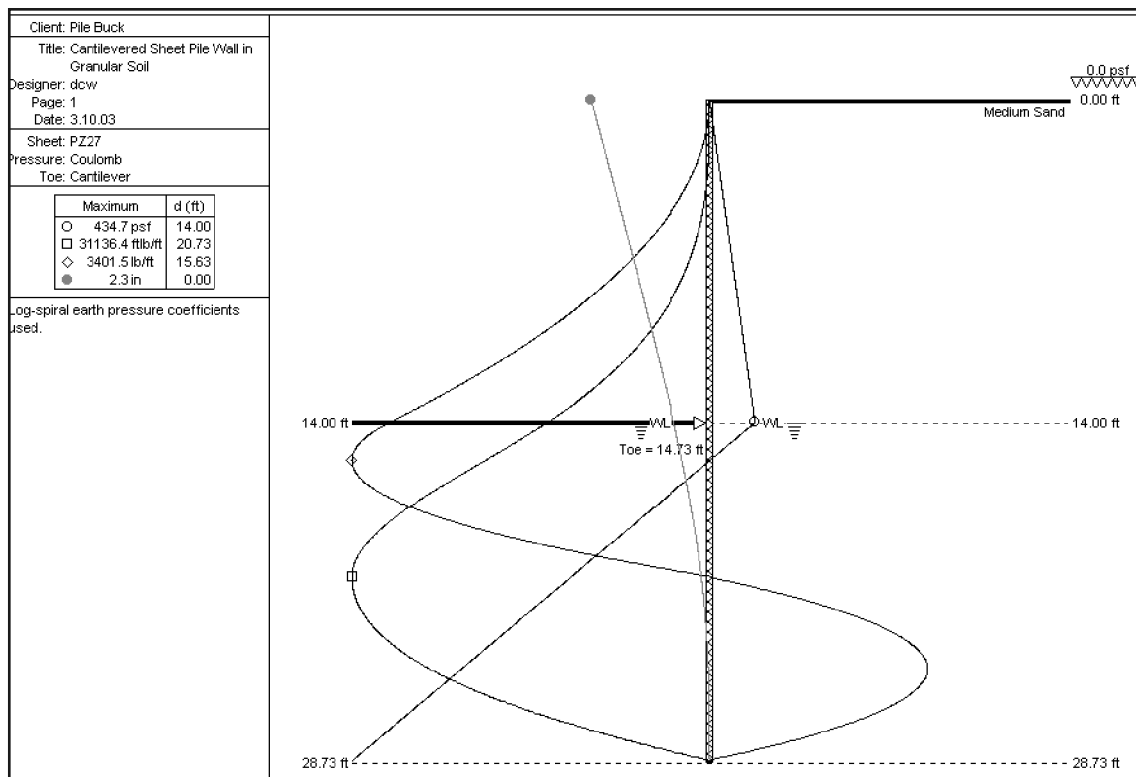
SPW 911 Example for Cantilevered Sheet Piling Wall in Cohesionless Soils
